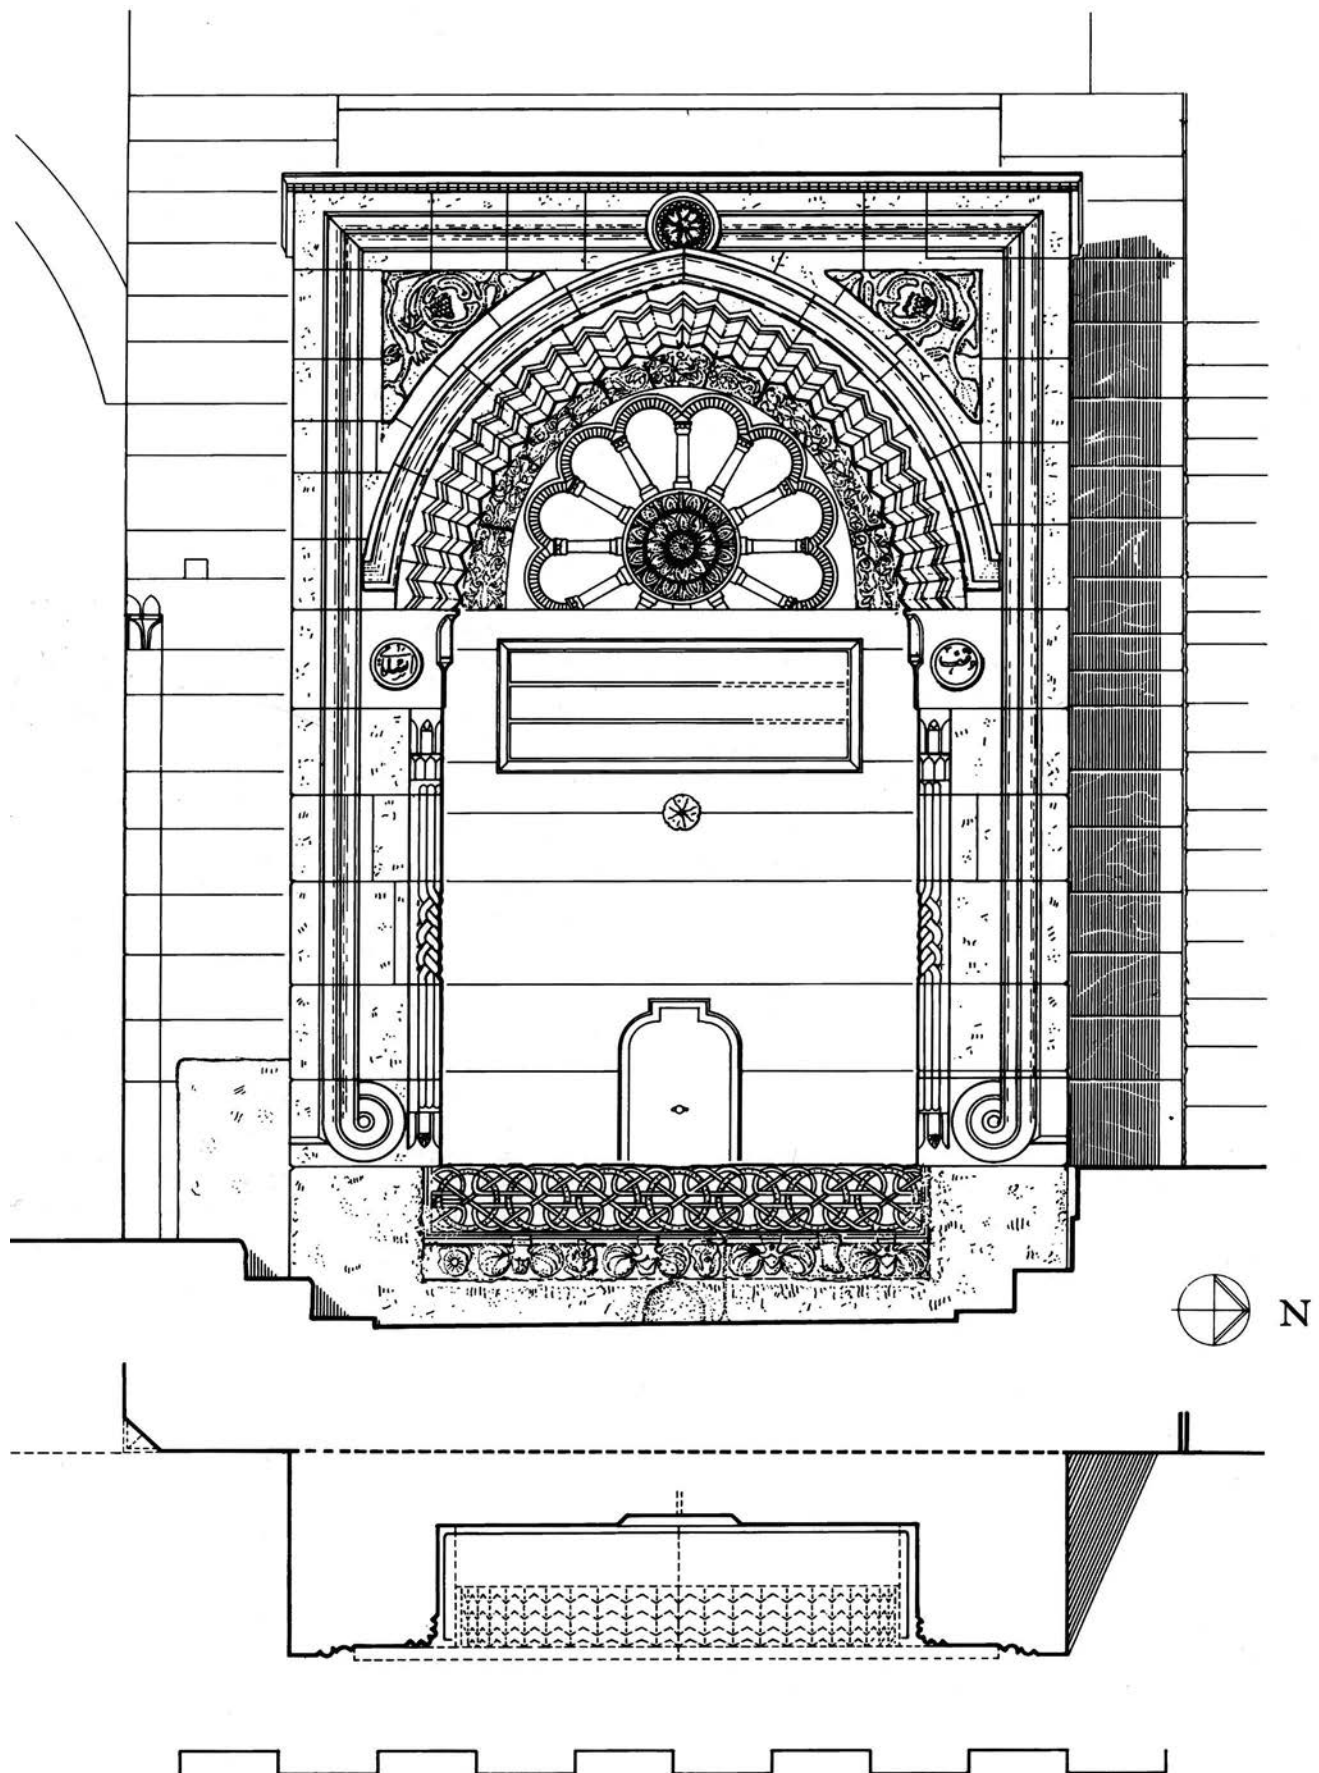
Sabil Bab al-Silsila, elevation and plan.
